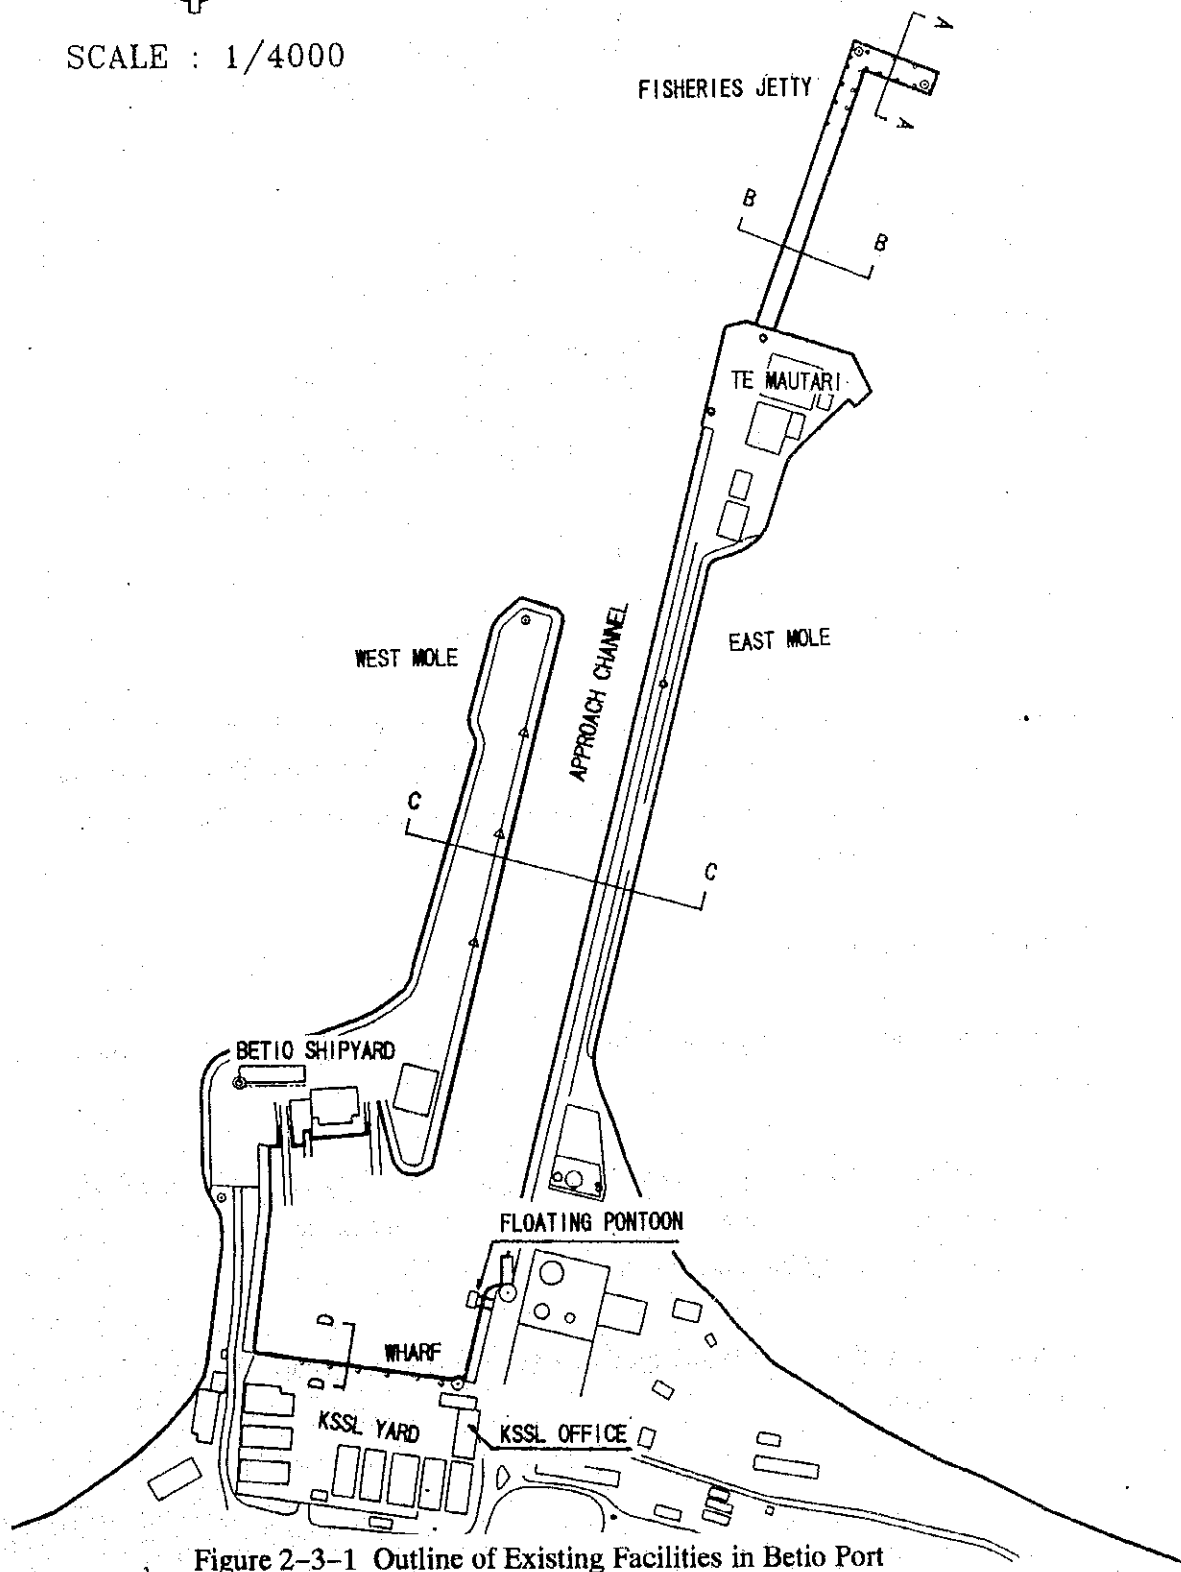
Outline of Existing Facilities in Betio Port
